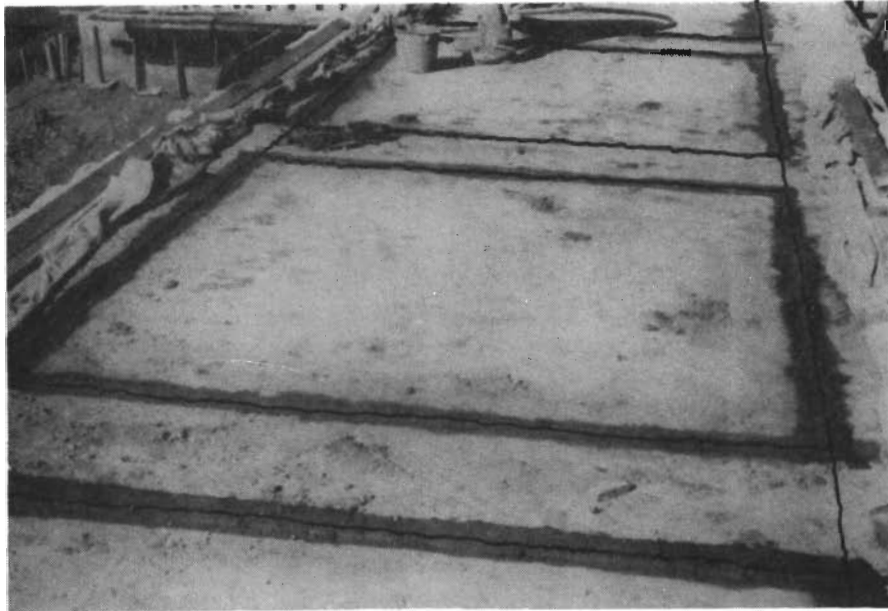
Location of spine cracking between precast units and cast-in-place construction upon spine completion
